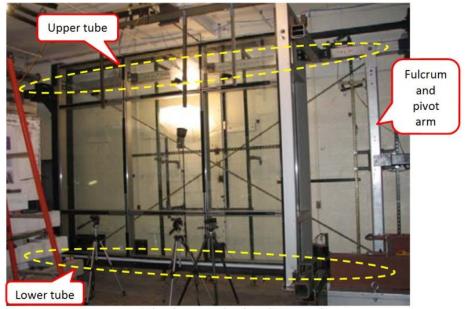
Typical Mockup Mounted on the Racking Test Facility
